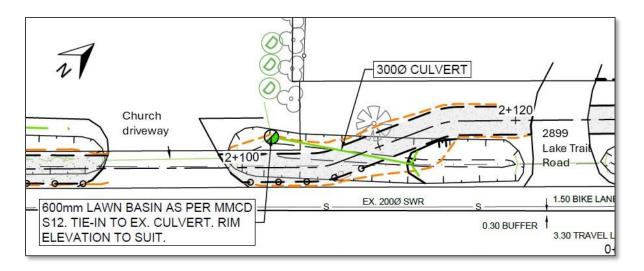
Proposed Project scope between the church driveway and 2899 Lake Trail Road driveway including culvert installation.
